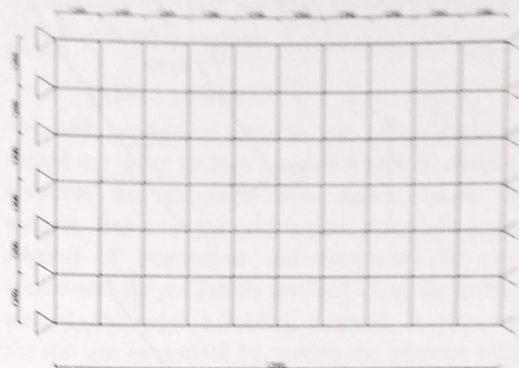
IDEALIZED GRILLAGE MODEL OF BRIDGE DECK.
